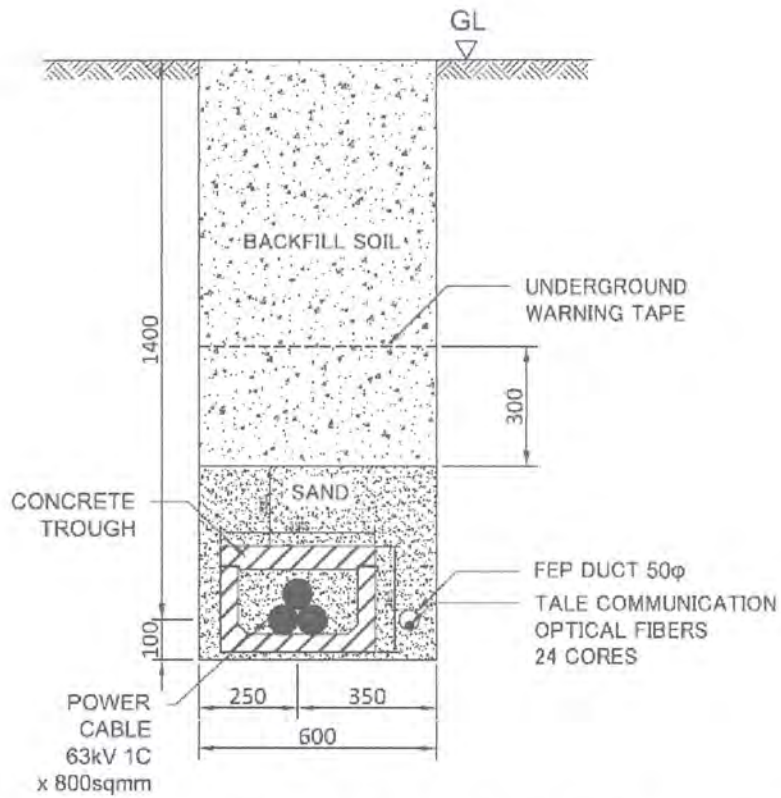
Laying method of underground cable (Under the Sidewalk)
